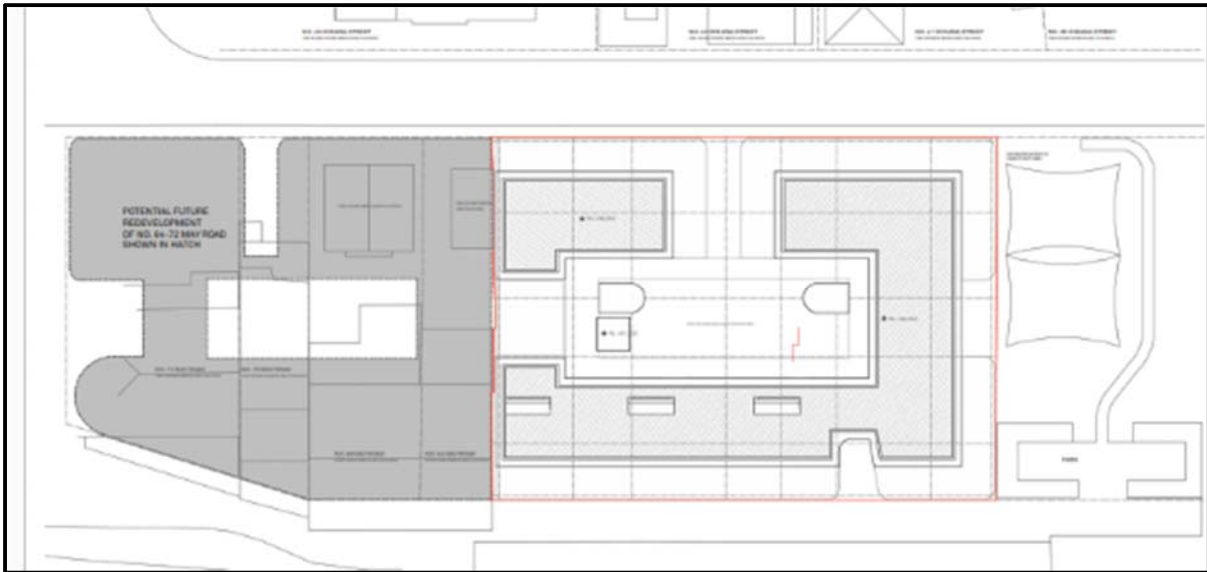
Site Plan (Source: Benson McCormack, Project No. 1853A)
